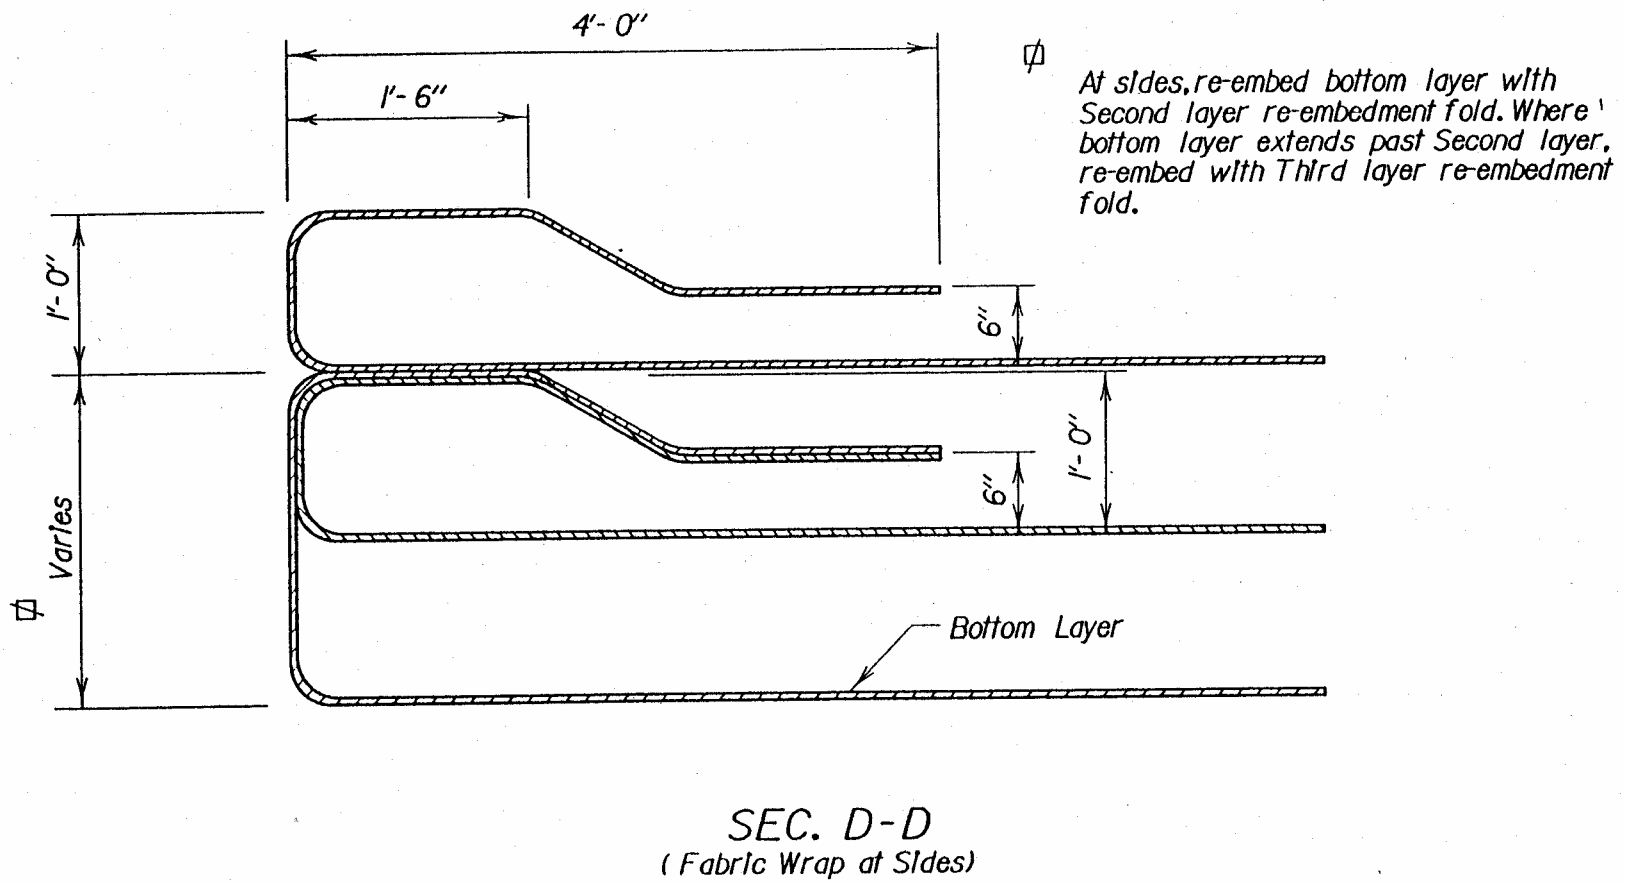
Design detail prior to 1999 of a typical side wrap section of the geotextile reinforced soil wall
